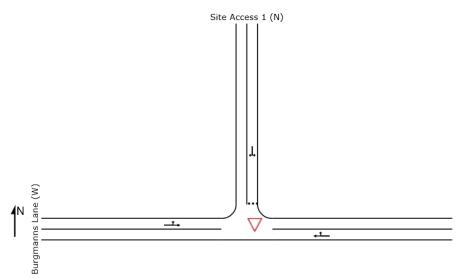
Intersection 2-1, Burgmanns Lane / Site Access 1 Intersection Layout Requirements
